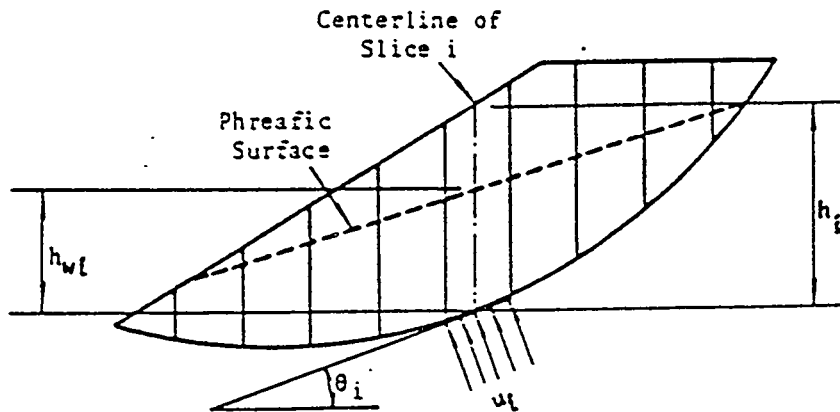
Typical Dam Cross Section with a Failure Plane
